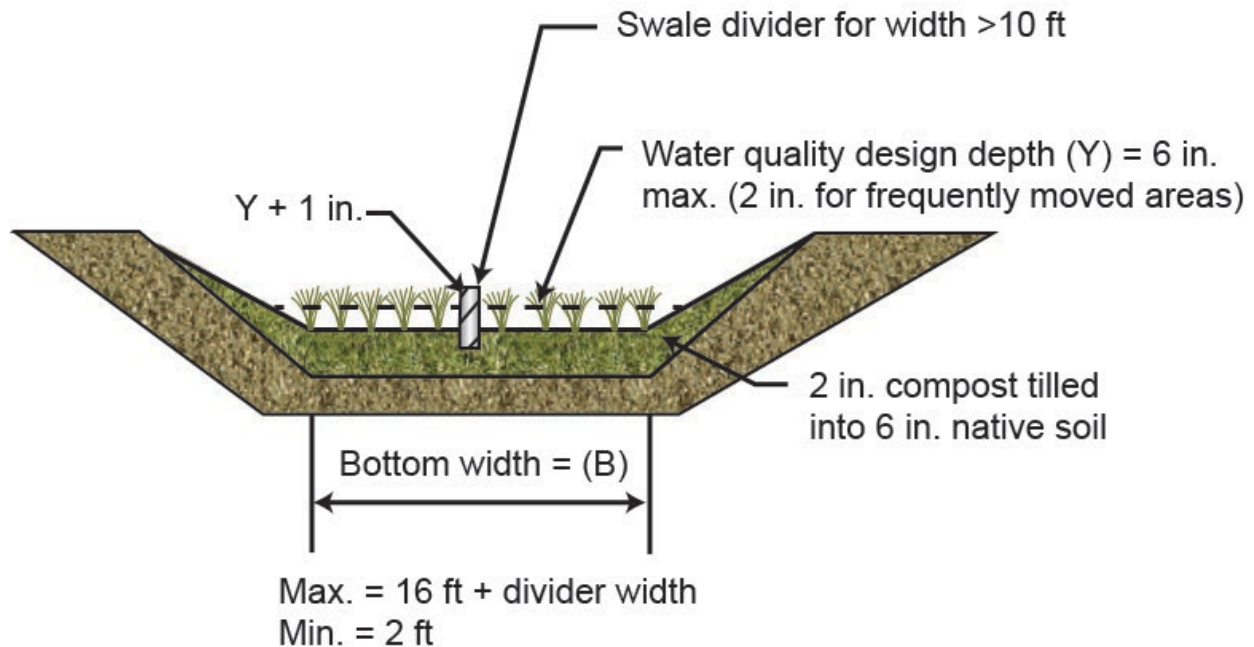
Typical biofiltration swale cross section (adapted from King County 2009).
